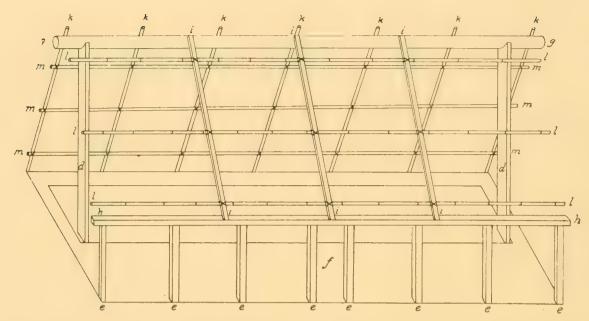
Diagram showing framework of a house: d, end posts; e, wall posts; f, door; g, ridgepole; h, stringer; i, rafters of front roof; k, rafters of back roof; l, cross braces of front roof; m, cross braces of back roof.
